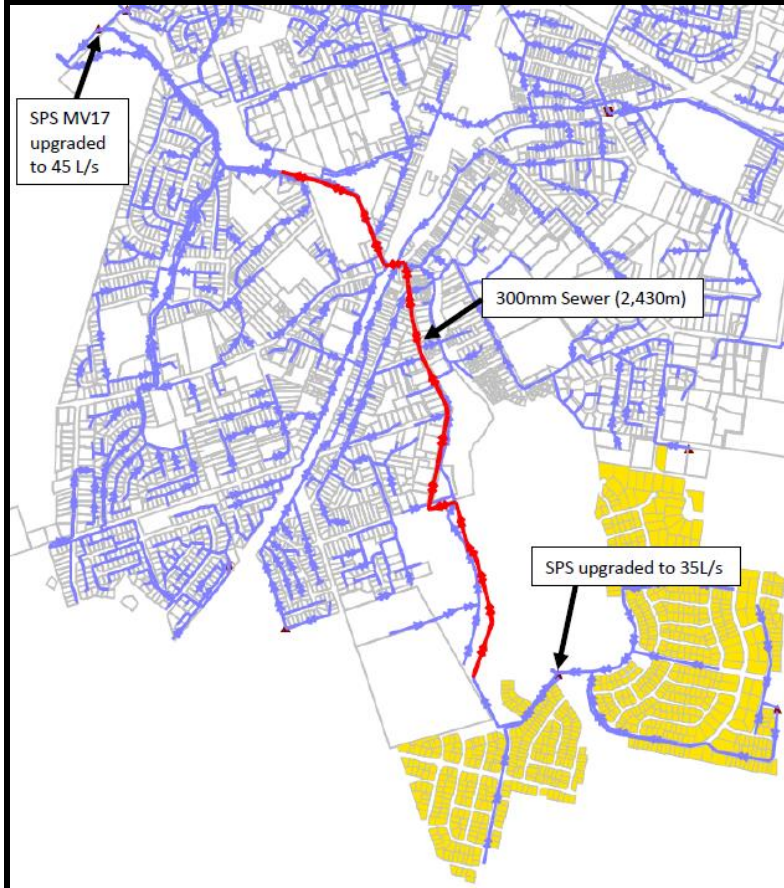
Proposed sewer servicing strategy for the concept plan (Source: UWS November 2019 Report)
